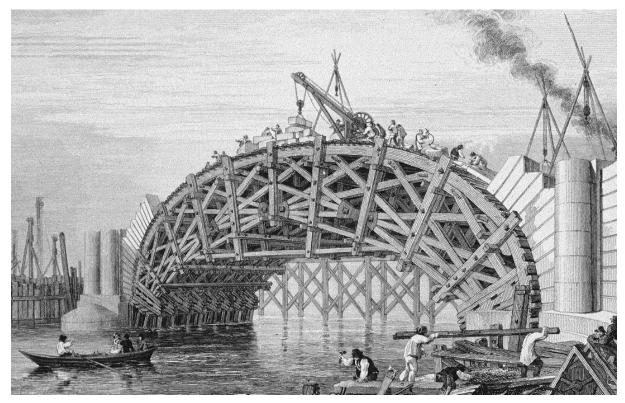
Wooden Centring used in the Construction of the Waterloo Bridge
